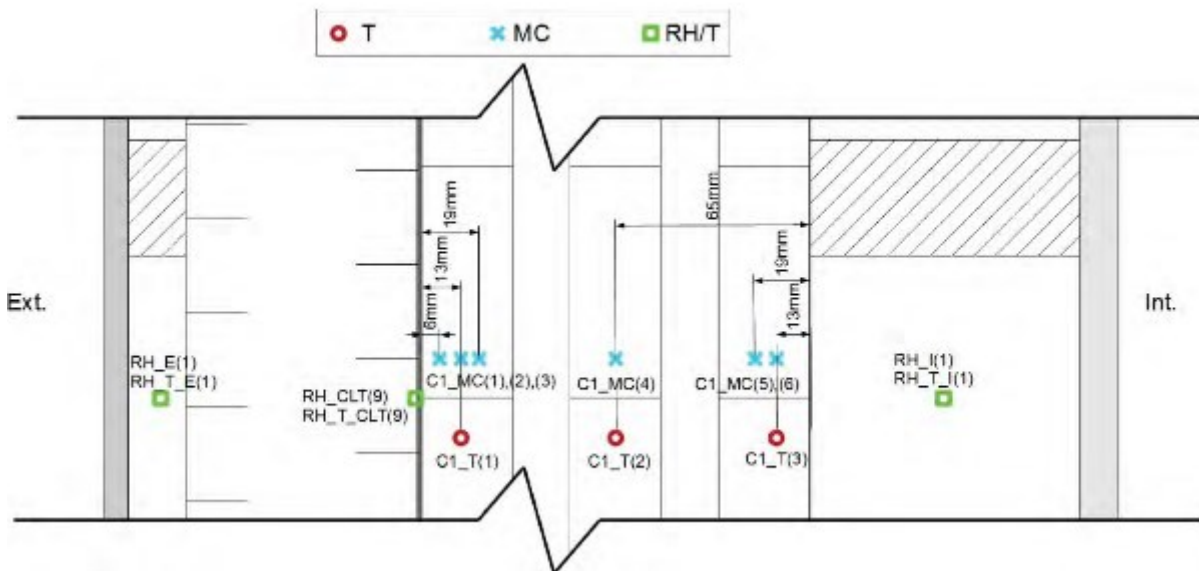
Typical sensor layout in CLT wall assemblies (McClung et al., 2014)
